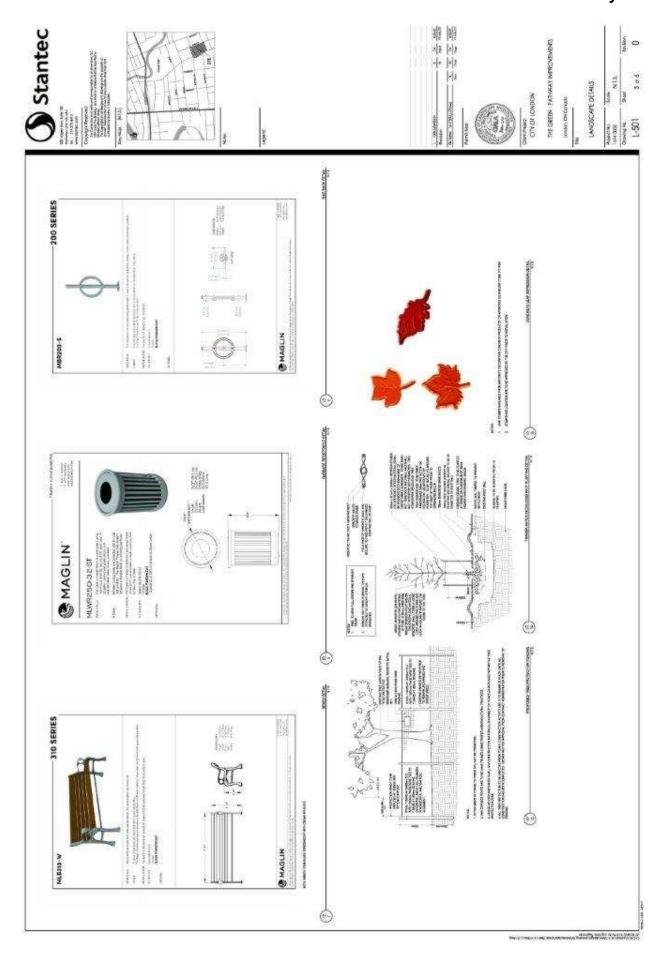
Drawing L-501: Landscape Details (April 2, 2018).
